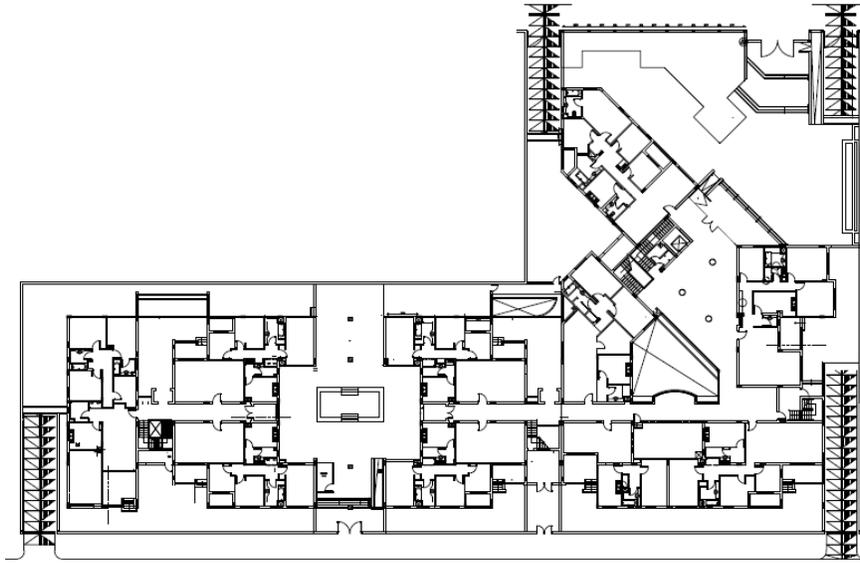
Building's Ground Floor plan (AUC Construction Office)
